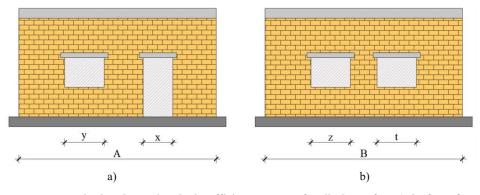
Measurements required to determine the insufficient amount of wall, shown for: a) the front facade, and b) the side facade
